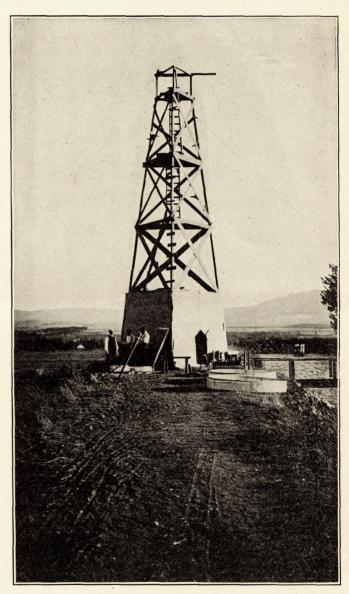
Tower No. 2, on the east bank of the reservoir, showing the landings for four pans, two of the 6-foot pans and several 2-foot pans on the ground near the tower. The towers are 40 feet high, built in a prism and guyed down with wire cables to withstand gusts of wind, as much as 40 miles per hour. The mountains on the right, looking south, include Mount Rose, about 16 miles distant.
